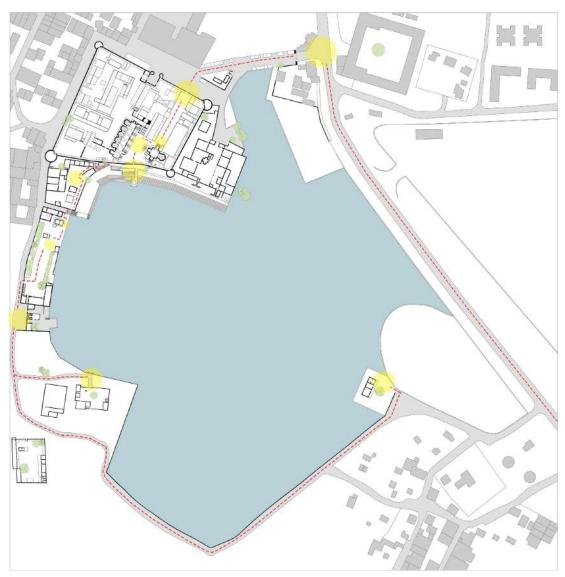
Plan showing pilgrimage route and pause points Source: Author
